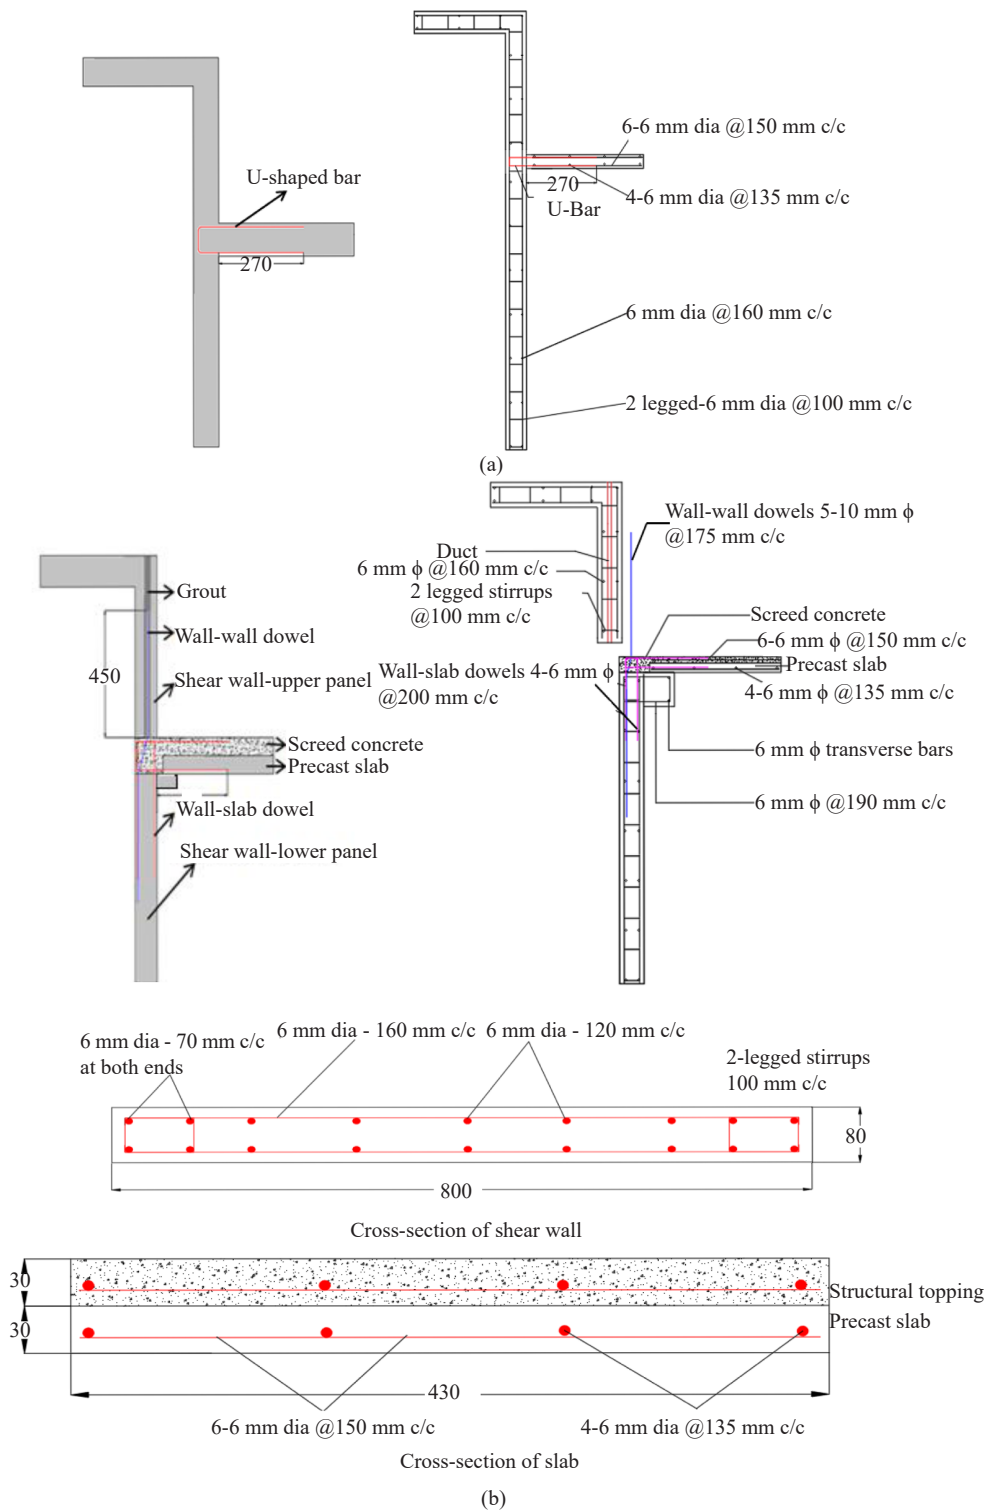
Reinforcement detailing: (a) monolithic specimen, (b) precast specimen
